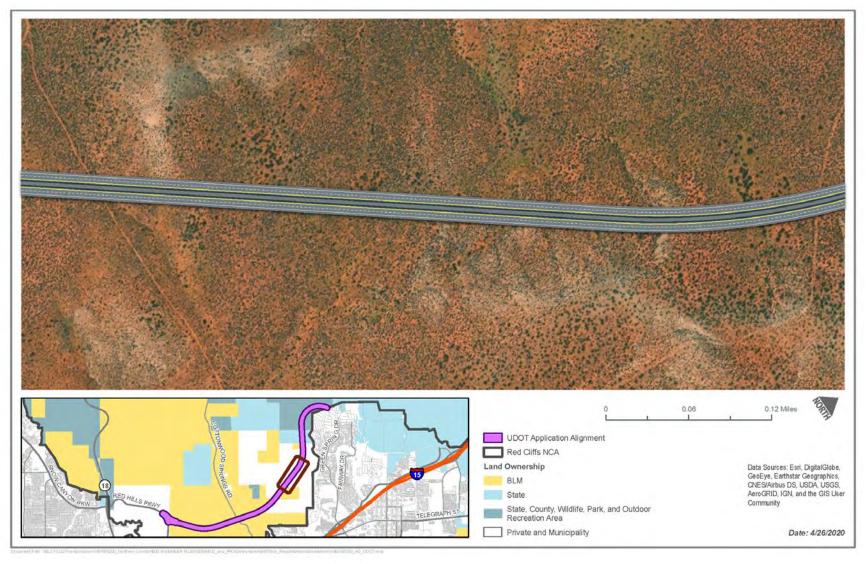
UDOT Application Alignment Plan View (6 of 9)
